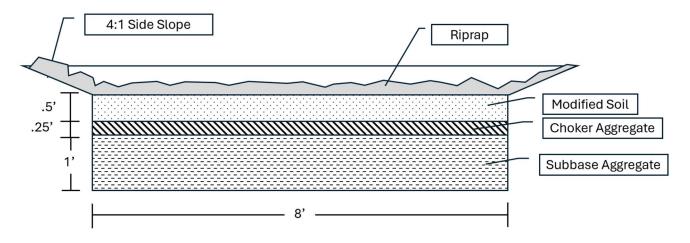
Typical bioswale cross-section showing rock check dam and modified base.
